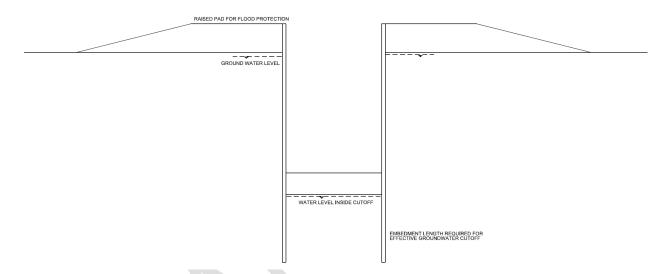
Typical Cross-section of Dry Excavation Method with Shaft Lining Cutoff Walls
